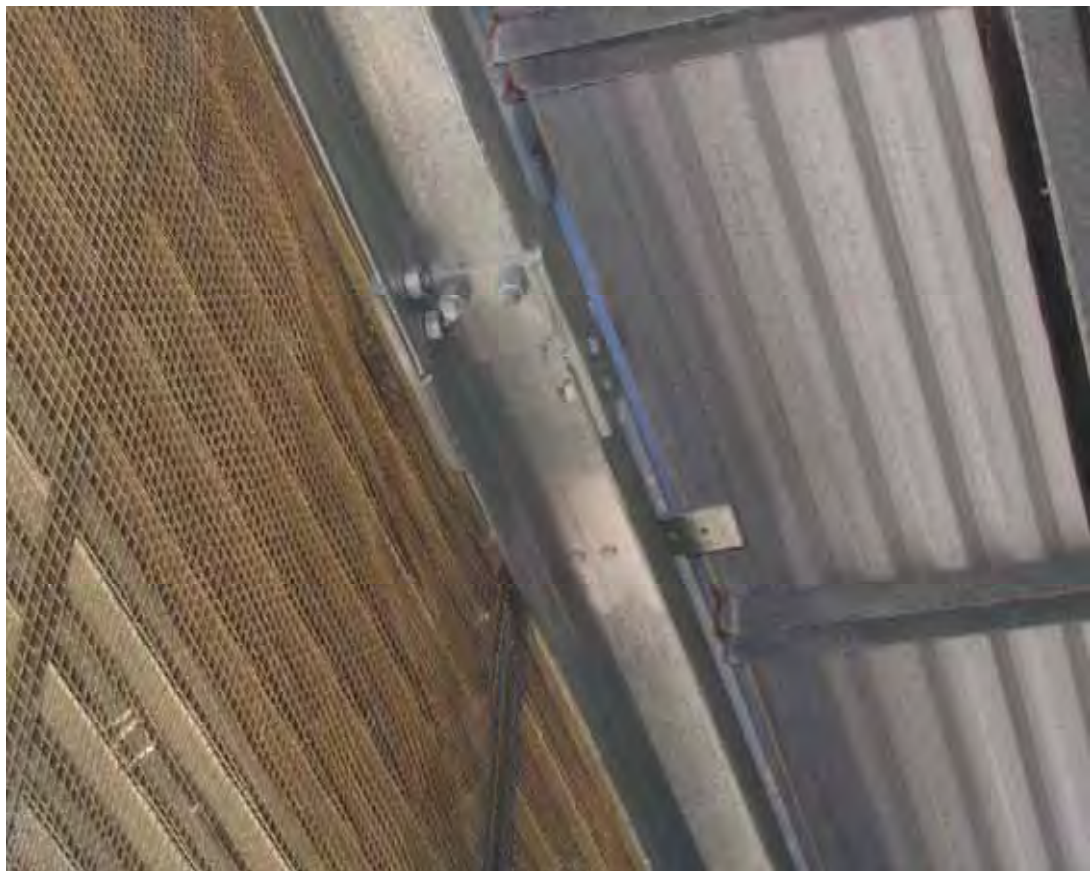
New hot dip galvanised PFCs designed to be sectioned in two halves to facilitate connection to bracket and louvre and to carry major load.
